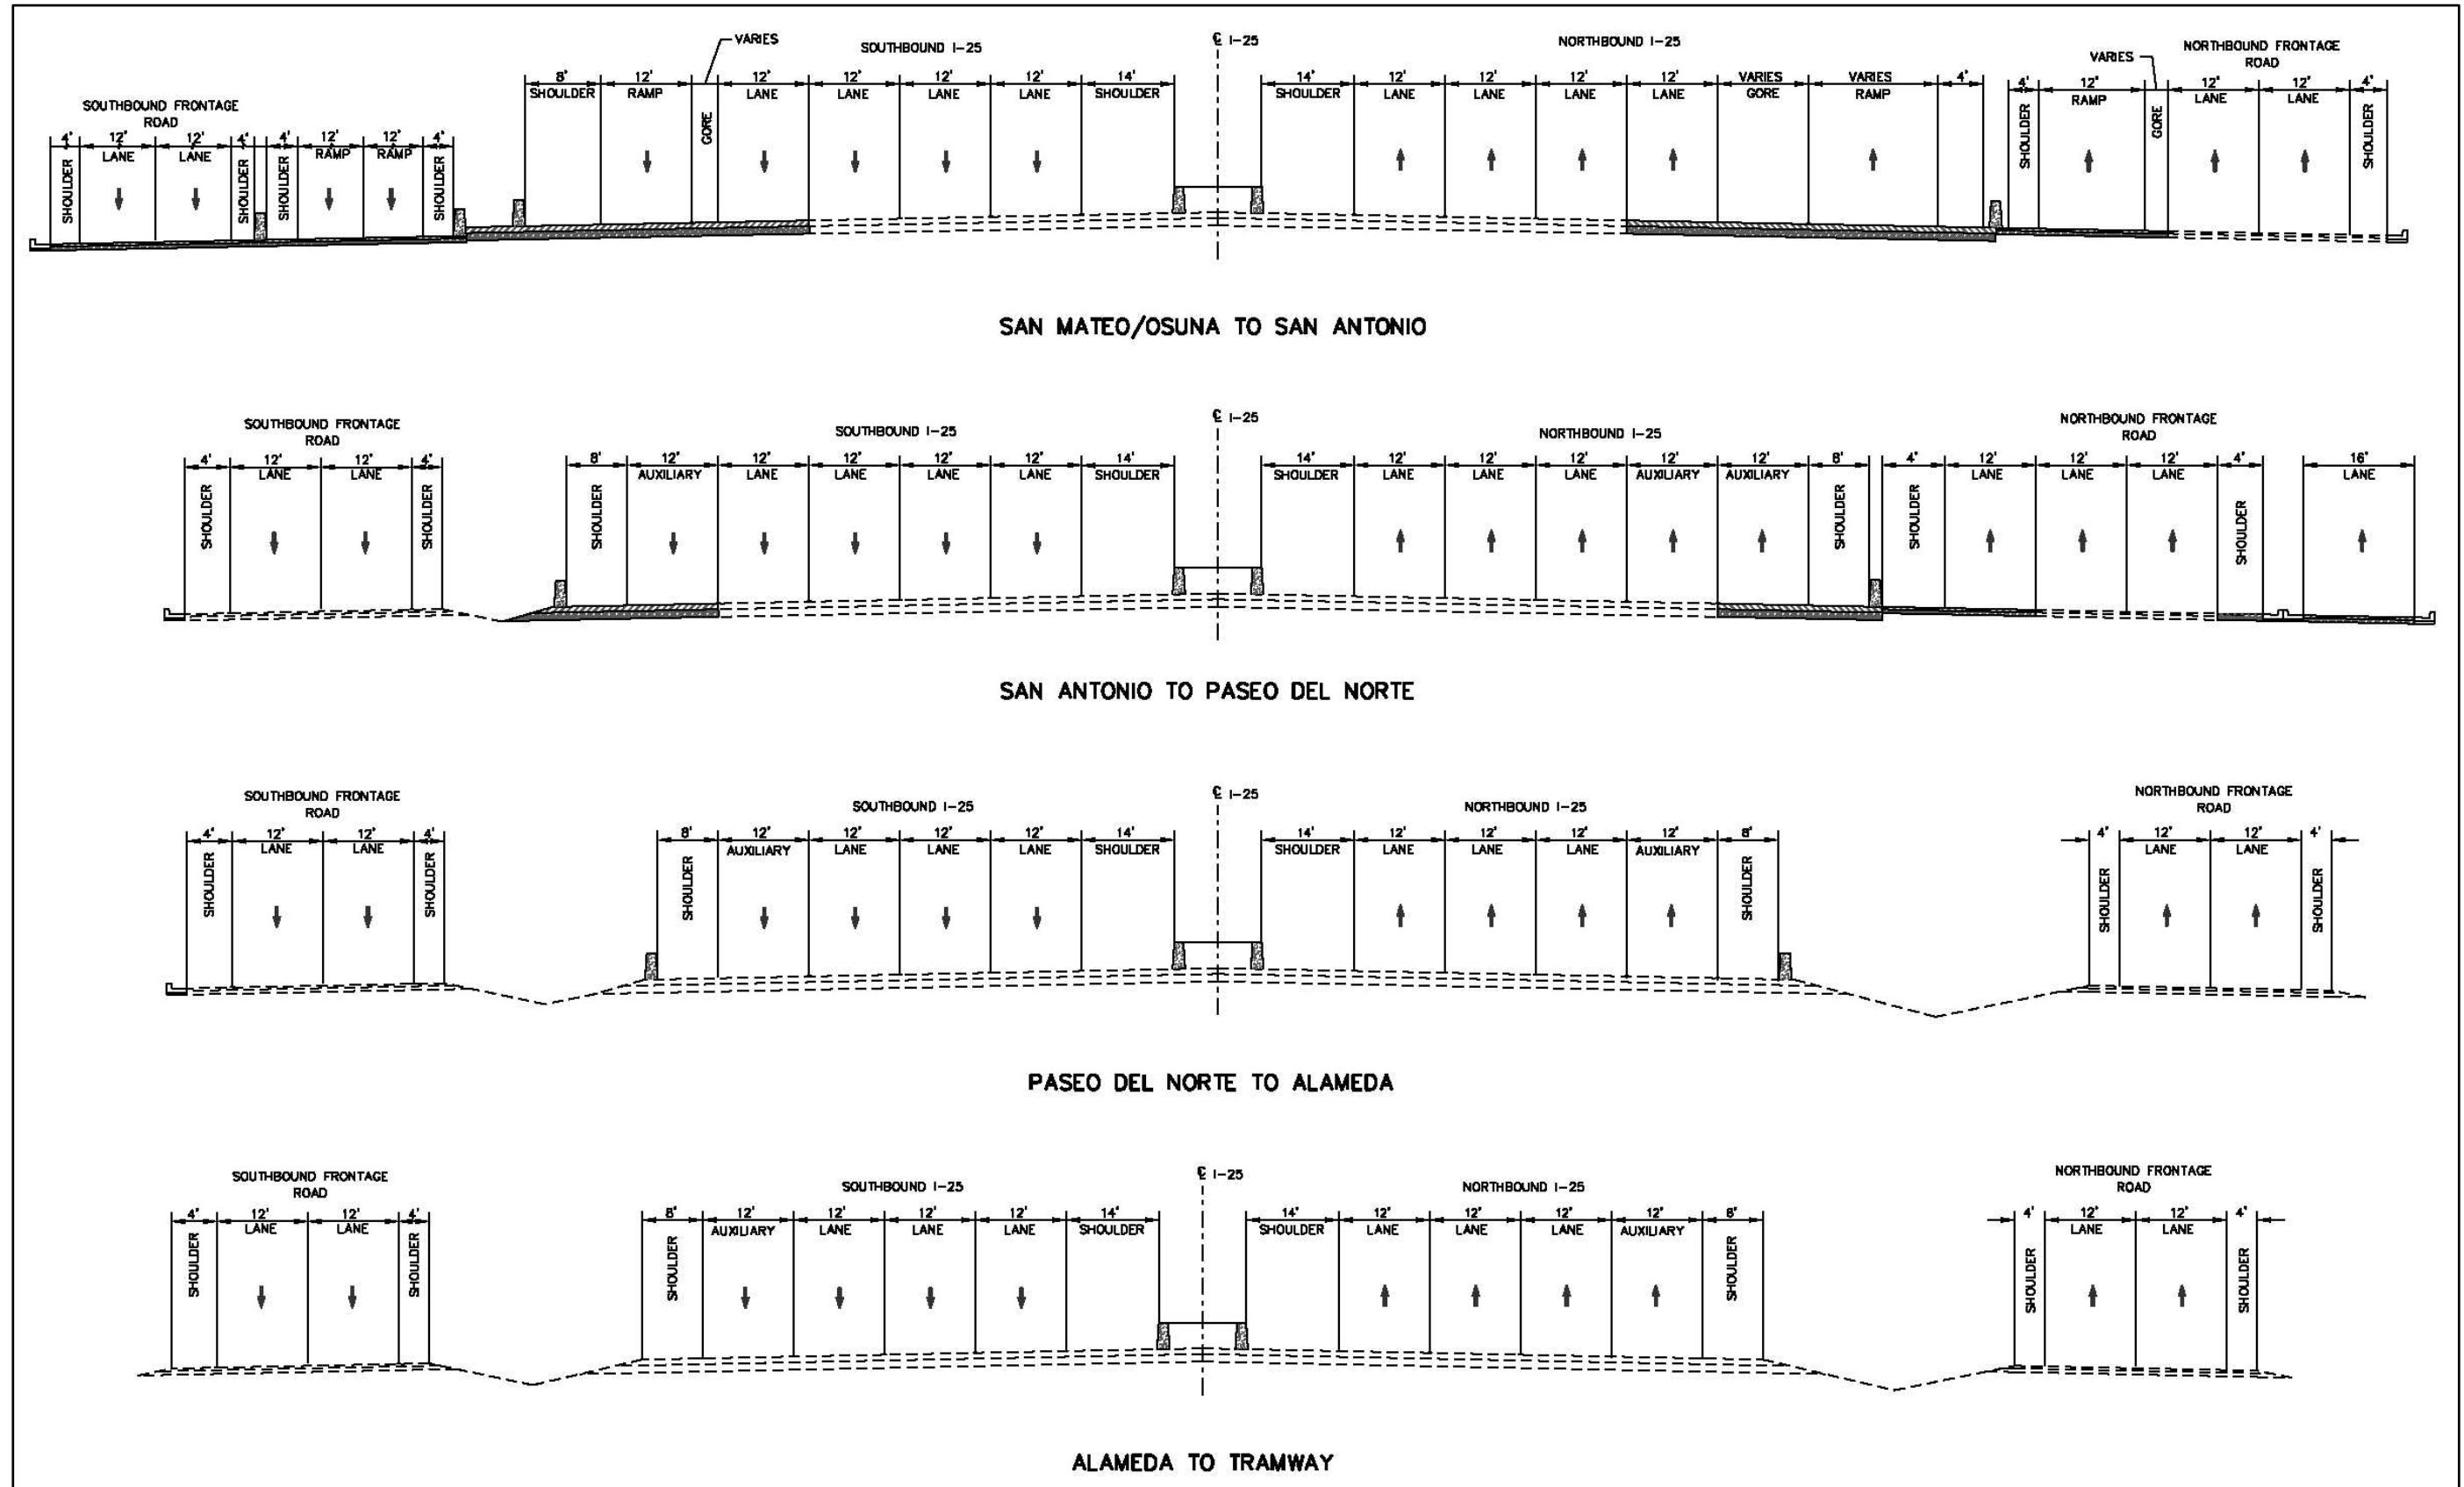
, Build Alternative 1 Typical Sections (continued)
